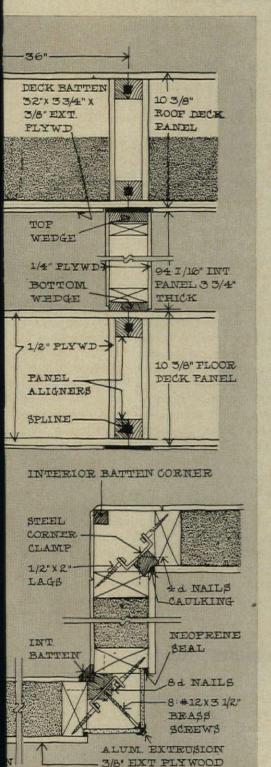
'-modular system show how splines and battens tie 3'x3' floor and roof panels
